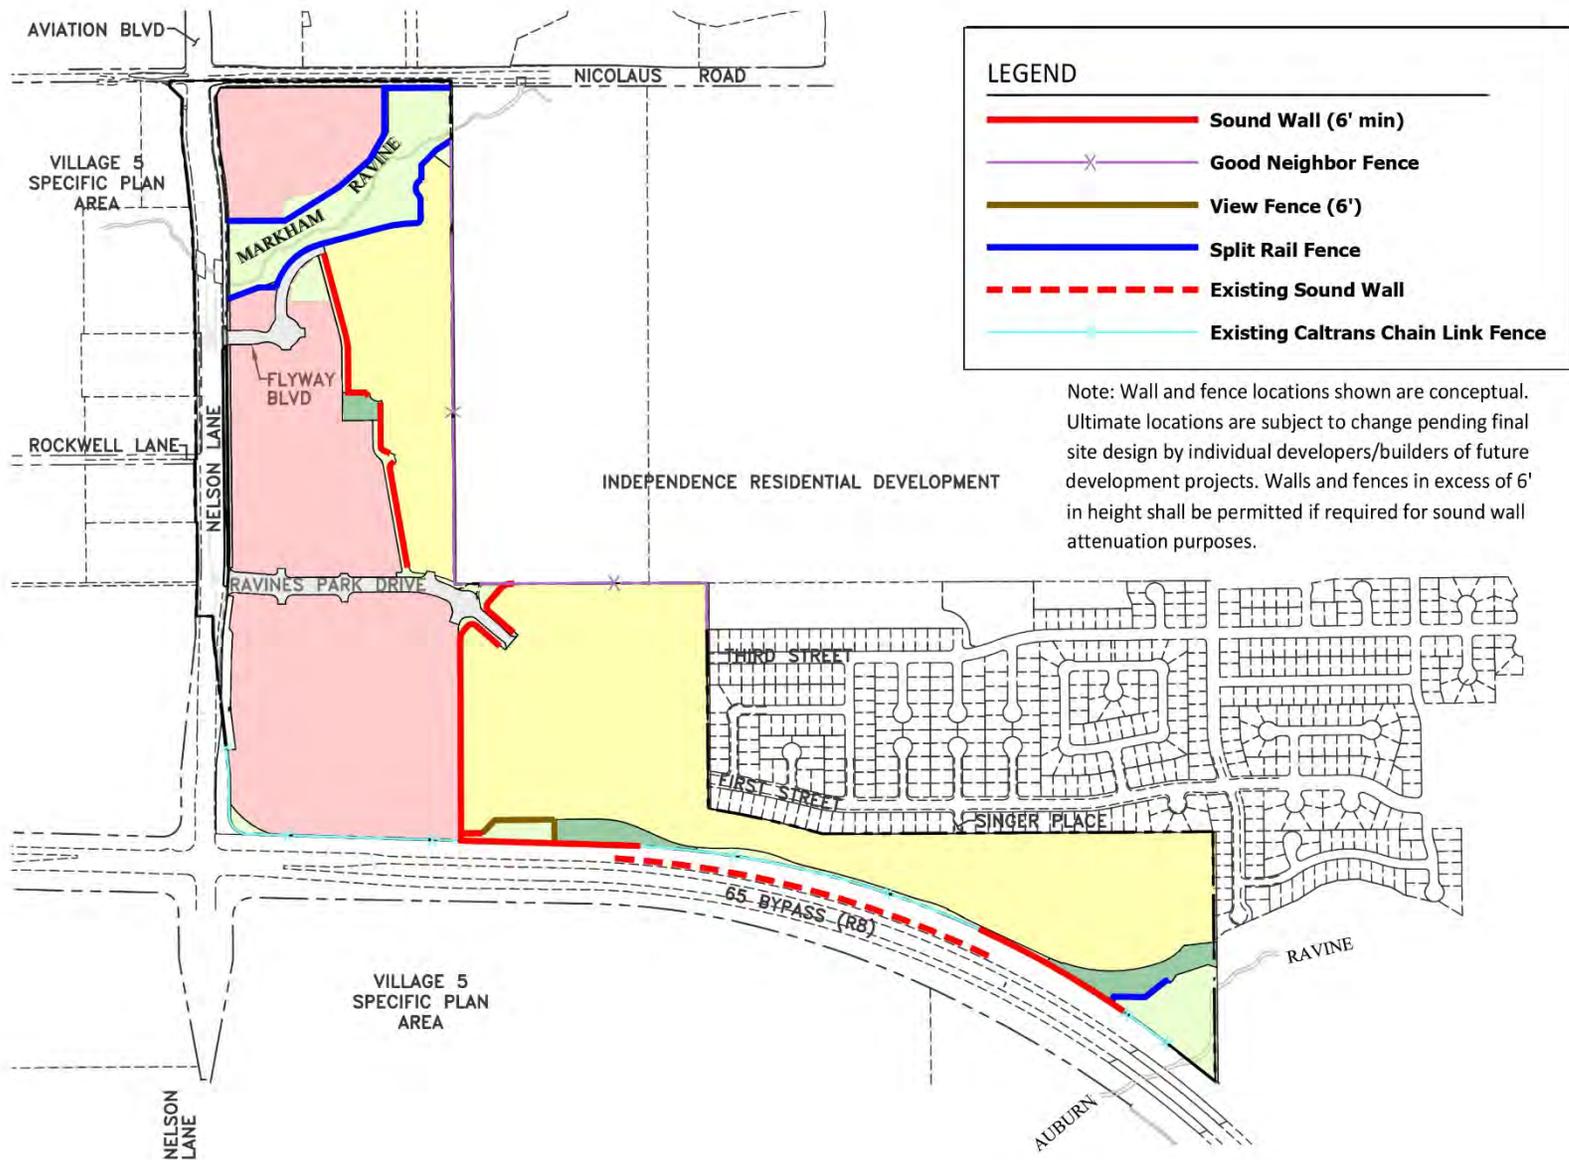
Conceptual Community Wall and Fencing Plan
